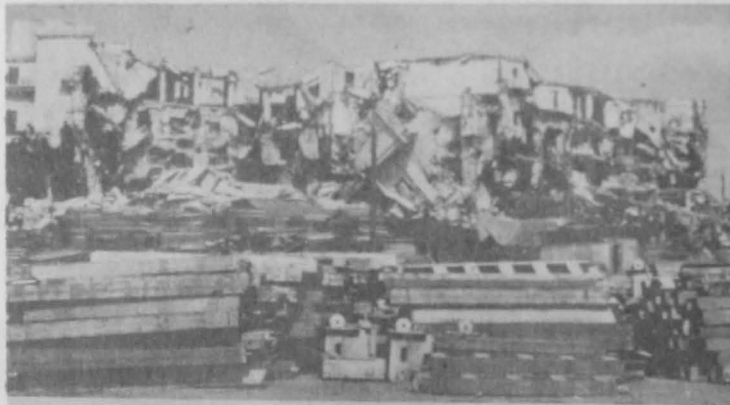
WAR DAMAGE IN MANILA. NEW BRIDGE STEEL IN FOREGROUND.
